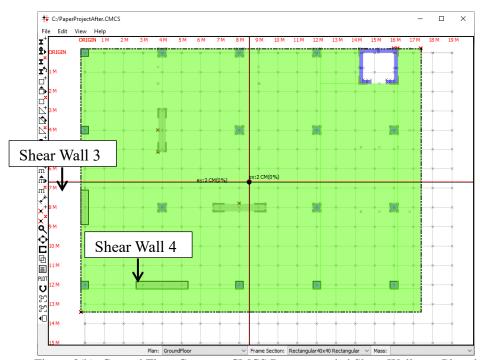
(b): Ground Floor Category CMCS Recommended Shear Walls are Placed
